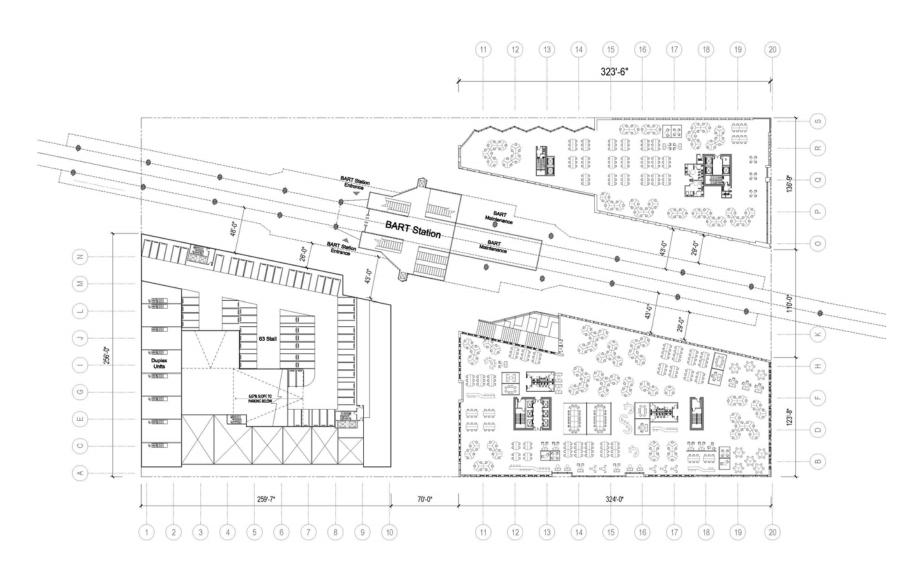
Floor Plan, 2<sup>nd</sup> Floor
